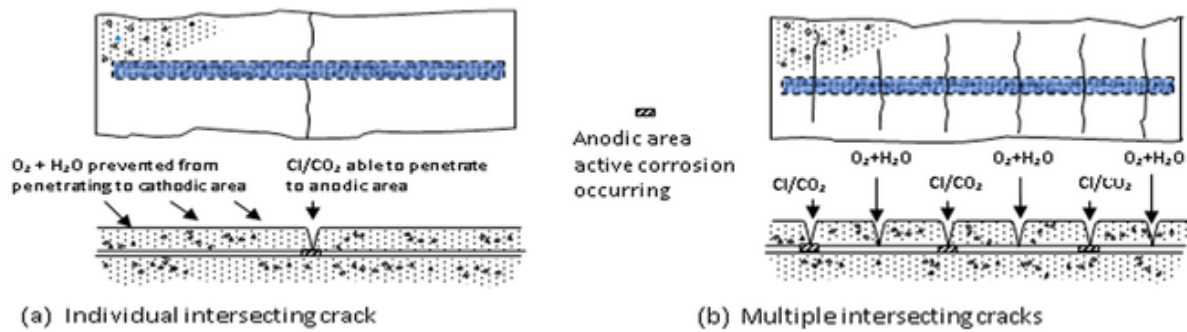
Cracks and corrosion (a) individual intersecting cracks (b) multiple intersecting cracks [12]
